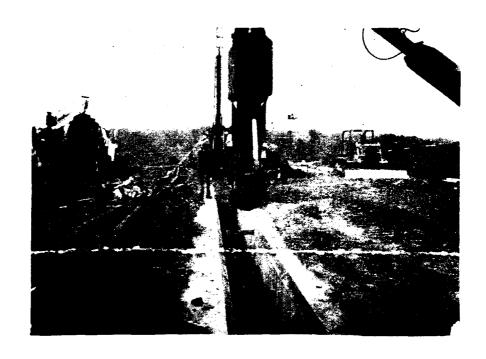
First bite with hydrolically operated kelley bar crane (November 10, 1983)
